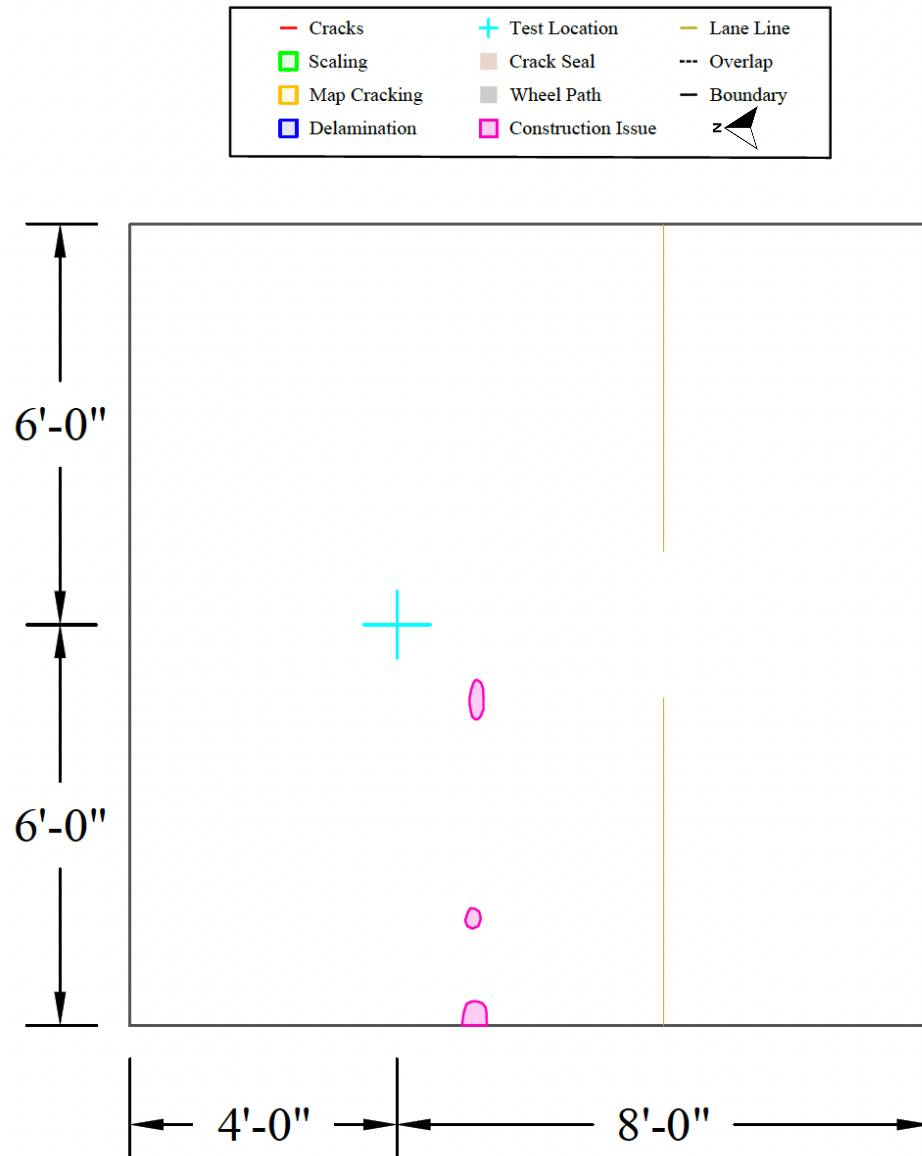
Test location 1 of lightweight concrete deck at bridge C-989.
